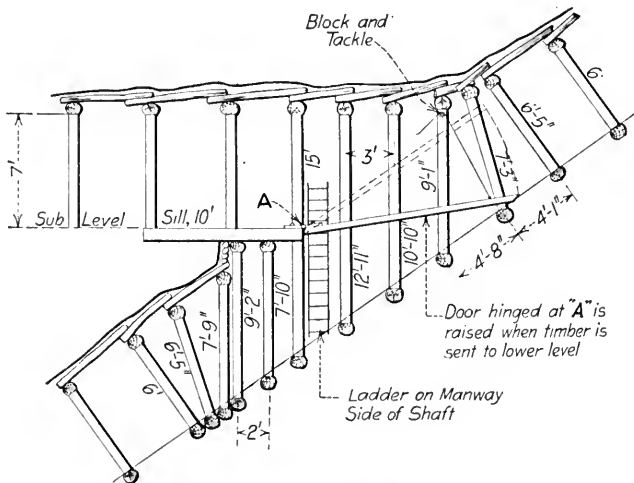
ARRANGEMENT OF TIMBERING AT SUBLEVEL.
